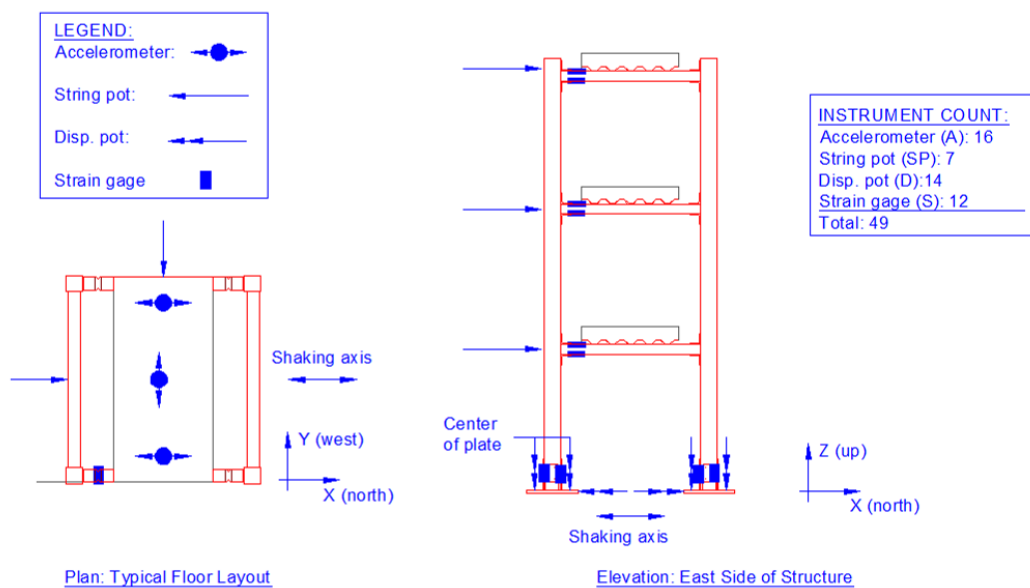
Basic instrumentation plan, typical floor plan and East elevation
